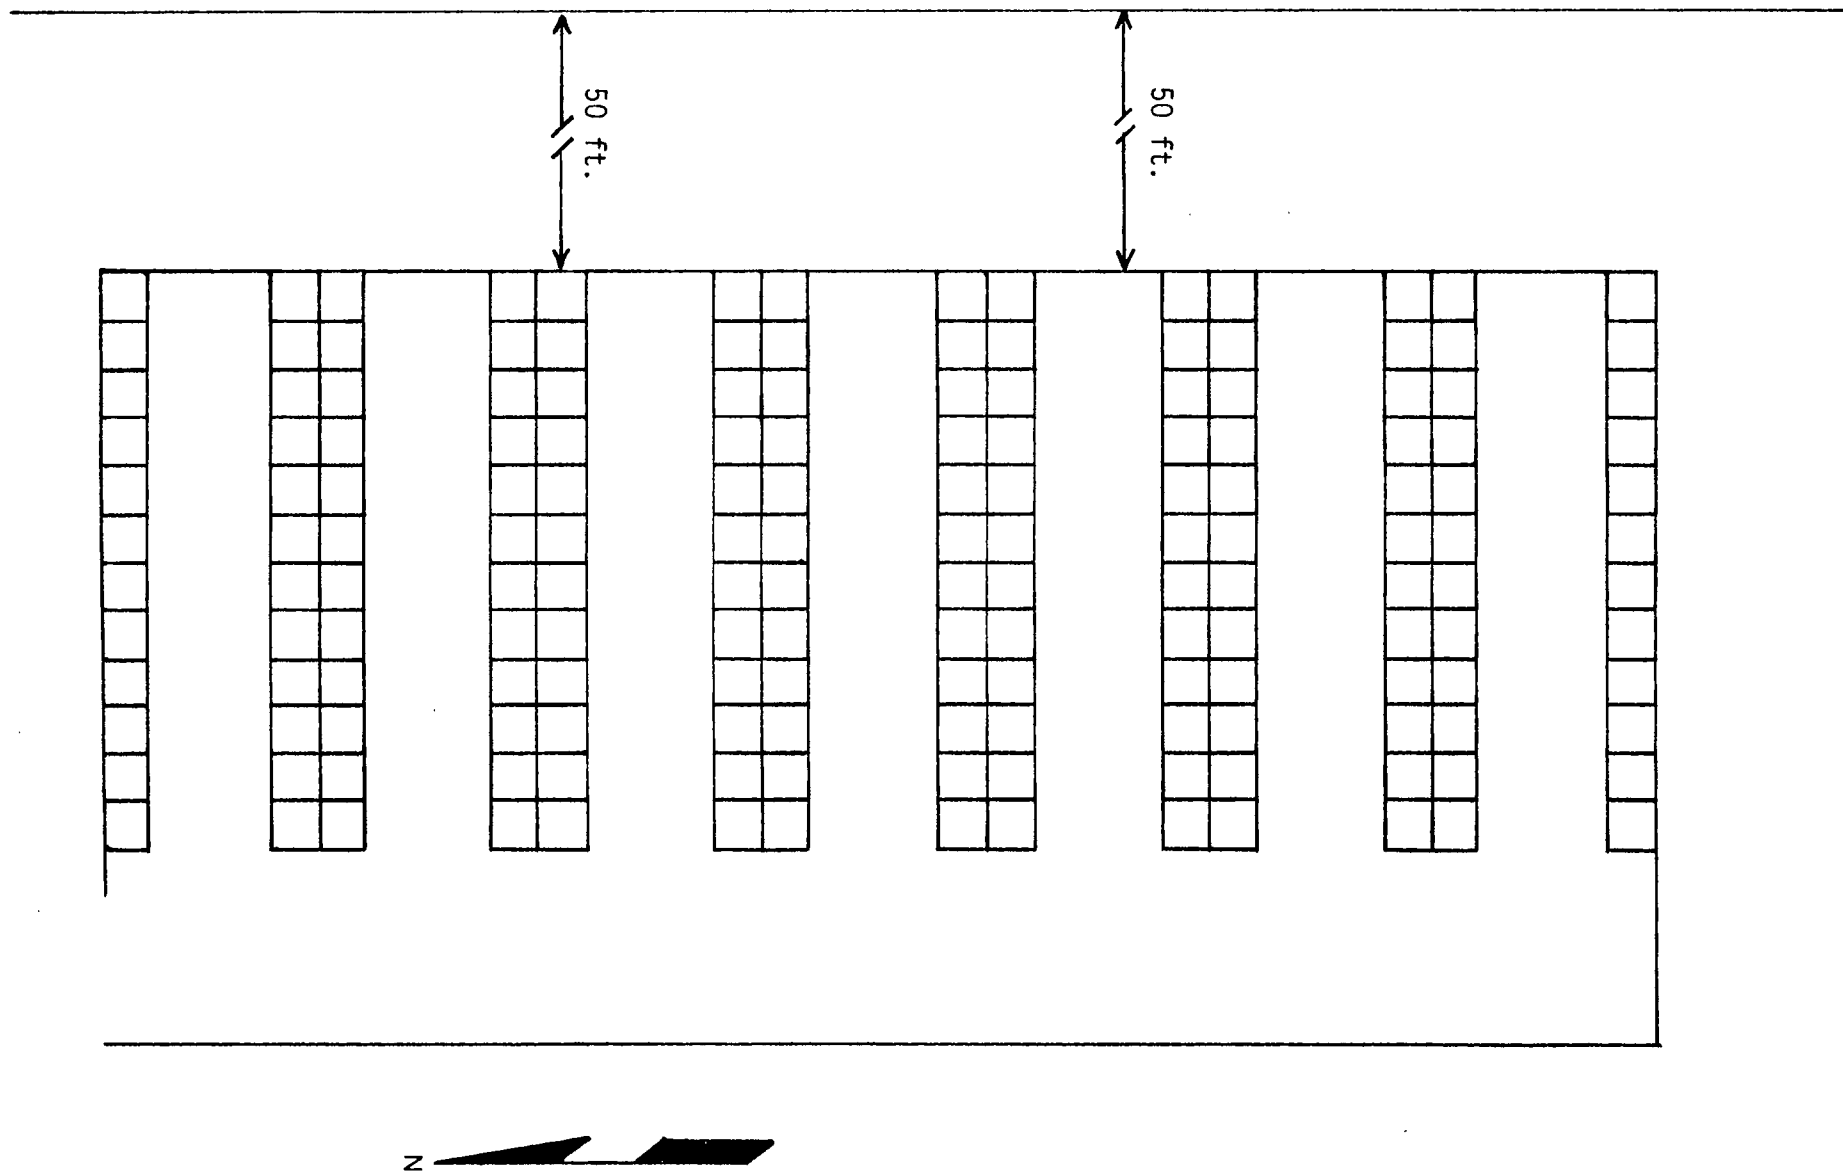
Arrangement of Drums Within the Drum Storage Building
